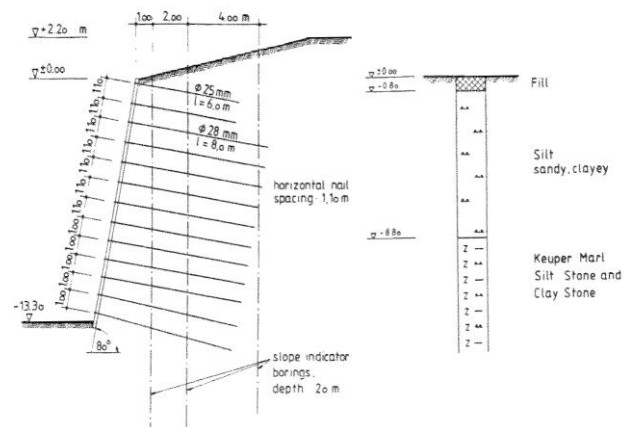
Typical layout of nailed walls (Stocker and Riedinger, 1990)
